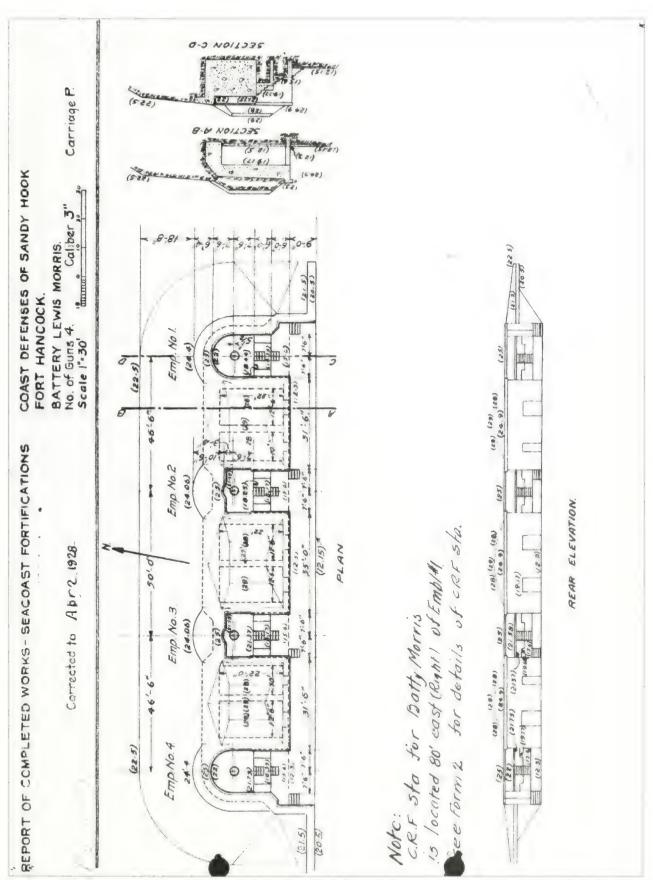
Plan, elevation, and sections of Battery Morris, 1928. Each of Battery Morris' four emplacements was separated by a magazine that featured a combination of concrete and earth cover. The top of the earth cover on the magazines rose seven feet above the gun platforms (Report of Completed Works, CDSG ePress).
